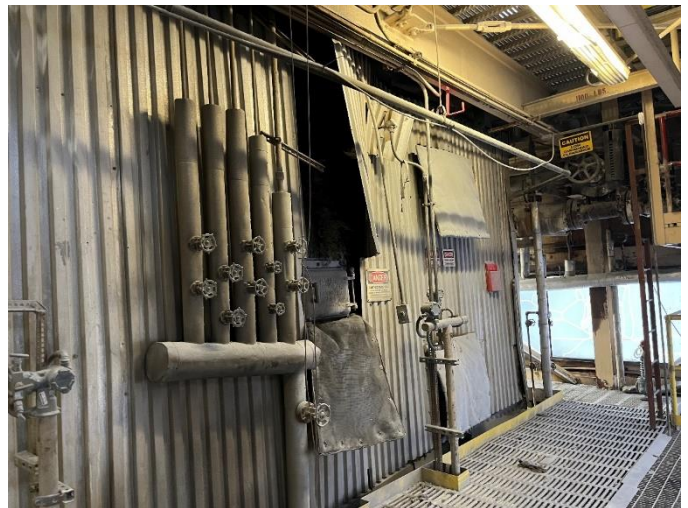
Unit 3 Lagging in poor condition in multiple locations at various elevations
